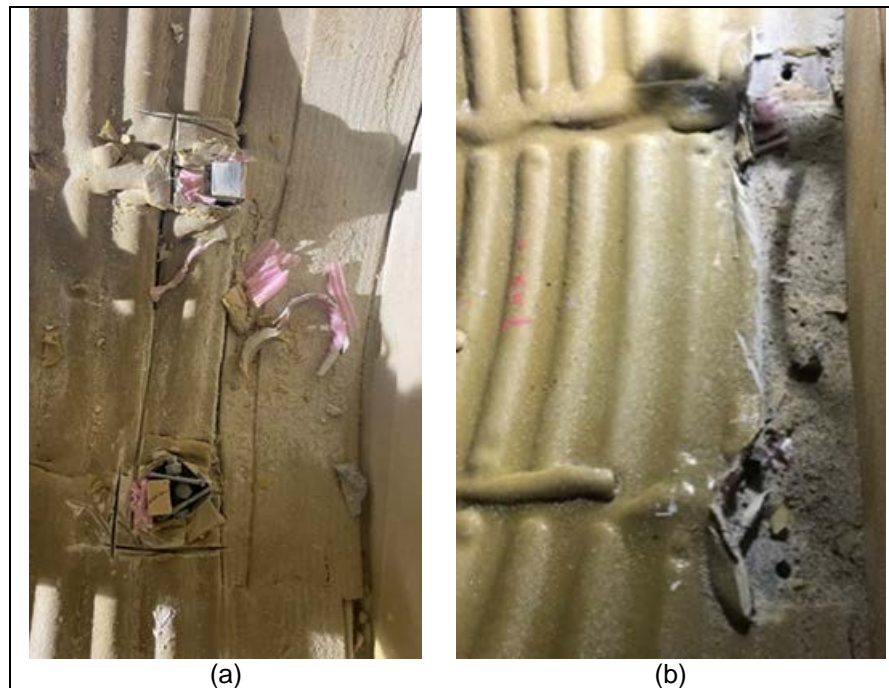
Invert-cut arch CMP end-strip detachment to remove the host pipe's ring stiffness: (a) over-sprayed SAPL and cutting process on the end-strip location, and (b) unbolted end-strip.
